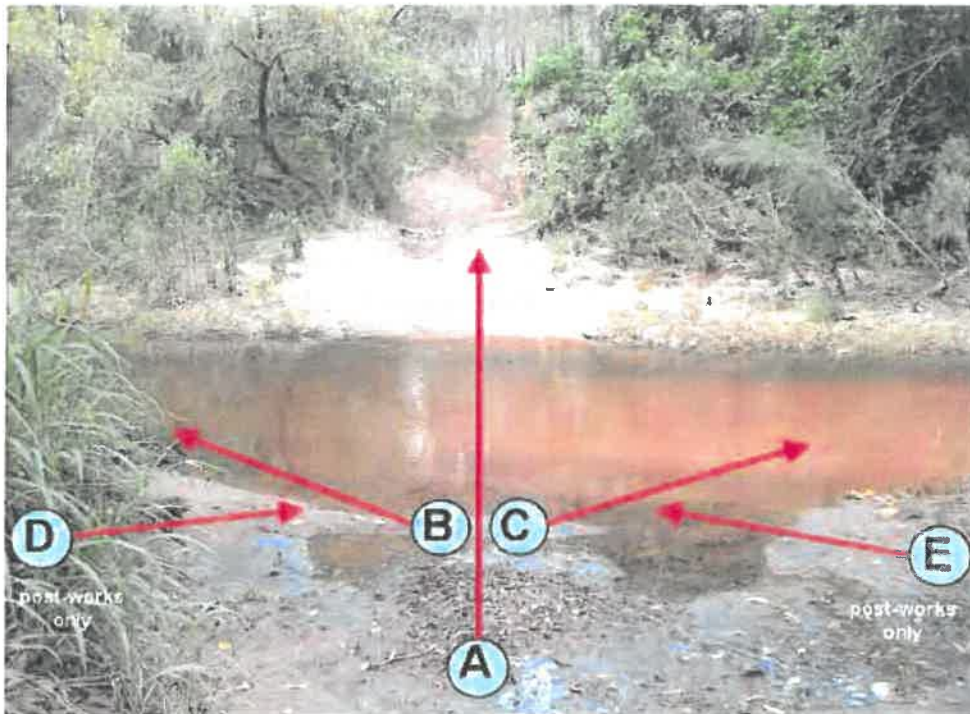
The location and direction of pre- and post-works photos at a site of proposed barrier works
